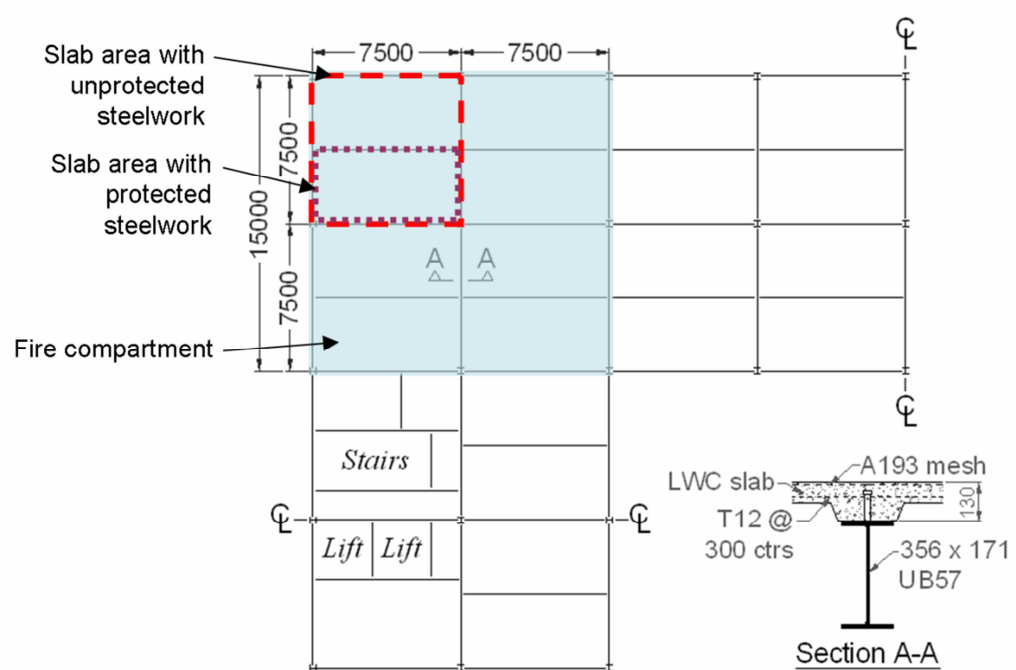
Partial building layout and cross-section of the composite slab (adapted from [165]).
